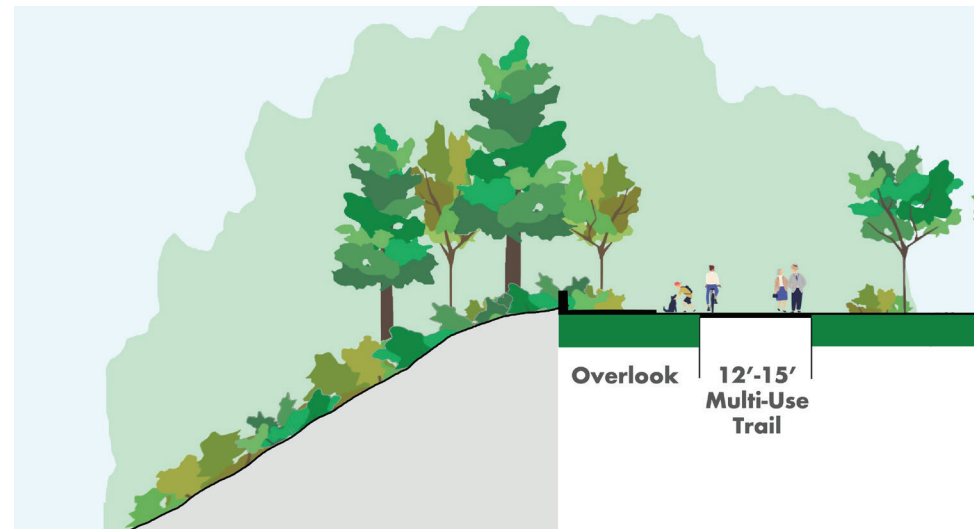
Typical Upland Section: Overlook and Multi-Use Trail
